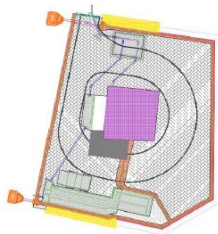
Option 1 – Proposed upgrade layout within the existing Pumpstation yard
